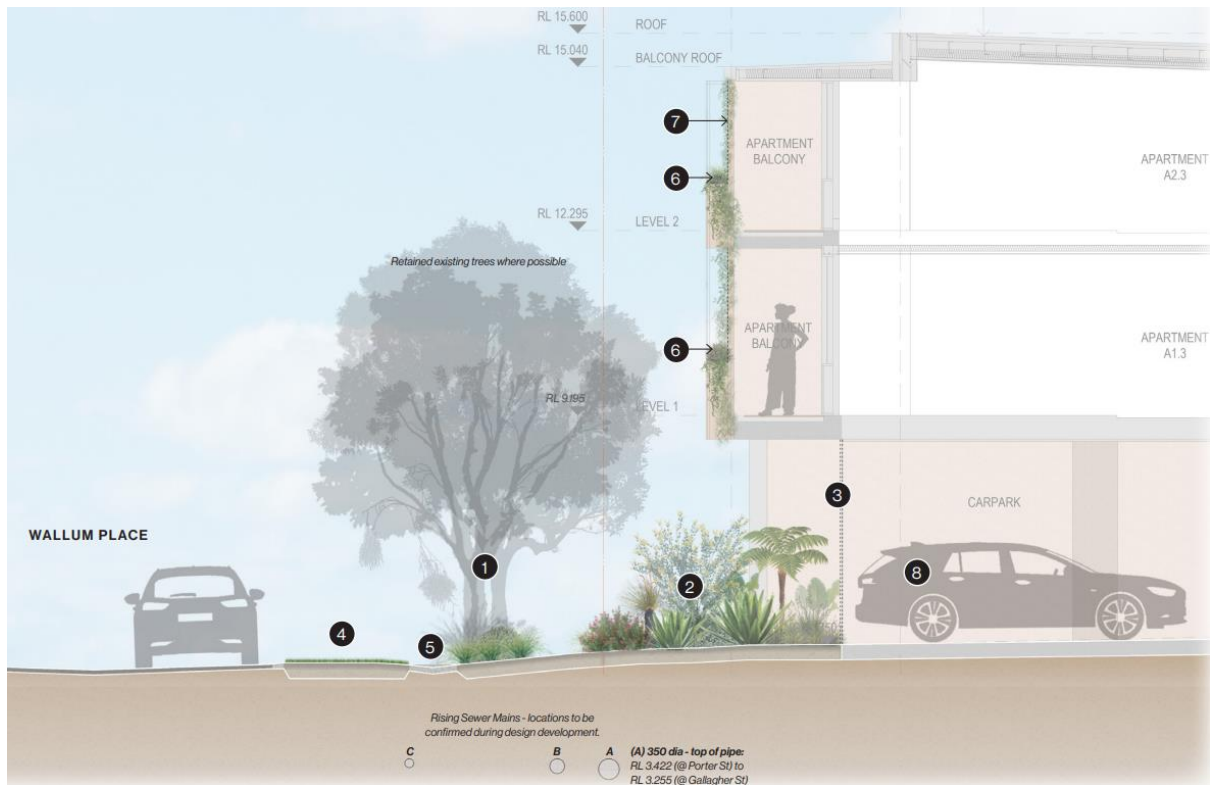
Wallum Place Section showing native shrubs, grasses and ferns in front of the ground level car parking area.
